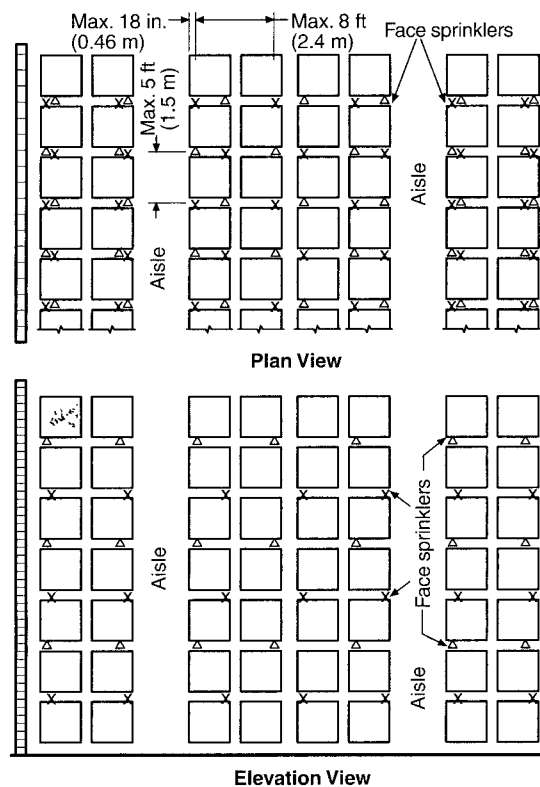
(e)* In-rack sprinkler arrangement, multiple-row racks, cartoned plastic and exposed unexpanded plastic, storage height over 25 ft (7.6 m).
